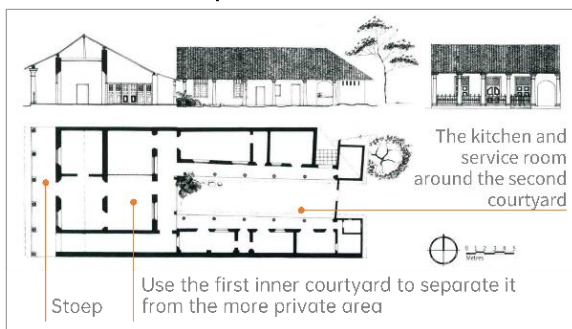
Plan of a typical Dutch house in Galle, redrawn by the author
